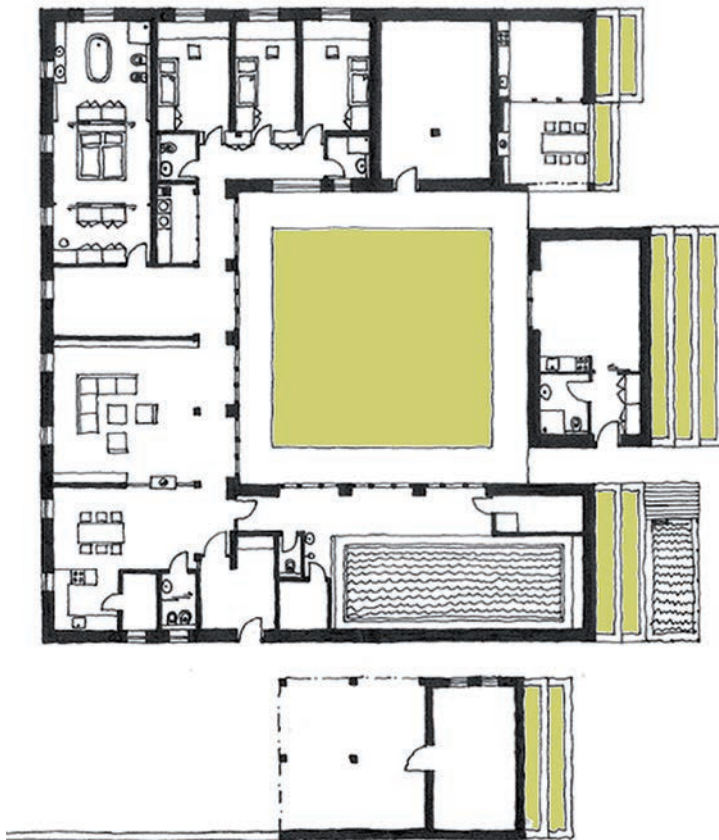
Floor plan. Design and drawing: M. Nedvěd
